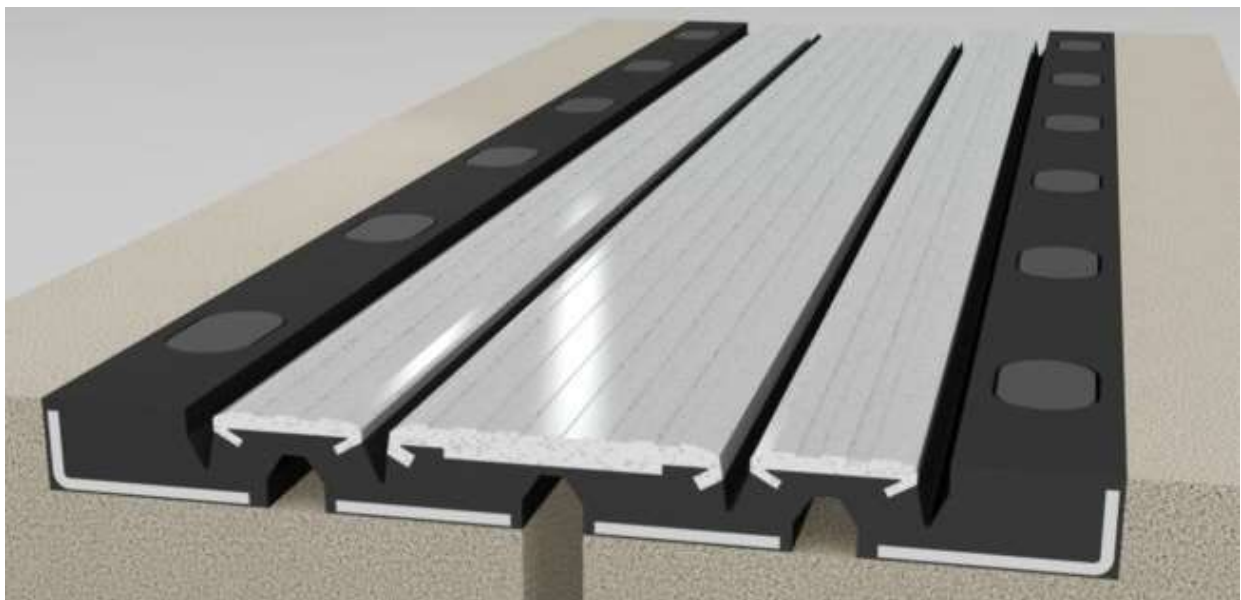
Section through 'as new' bridge joint, as taken from a manufacturer's website
